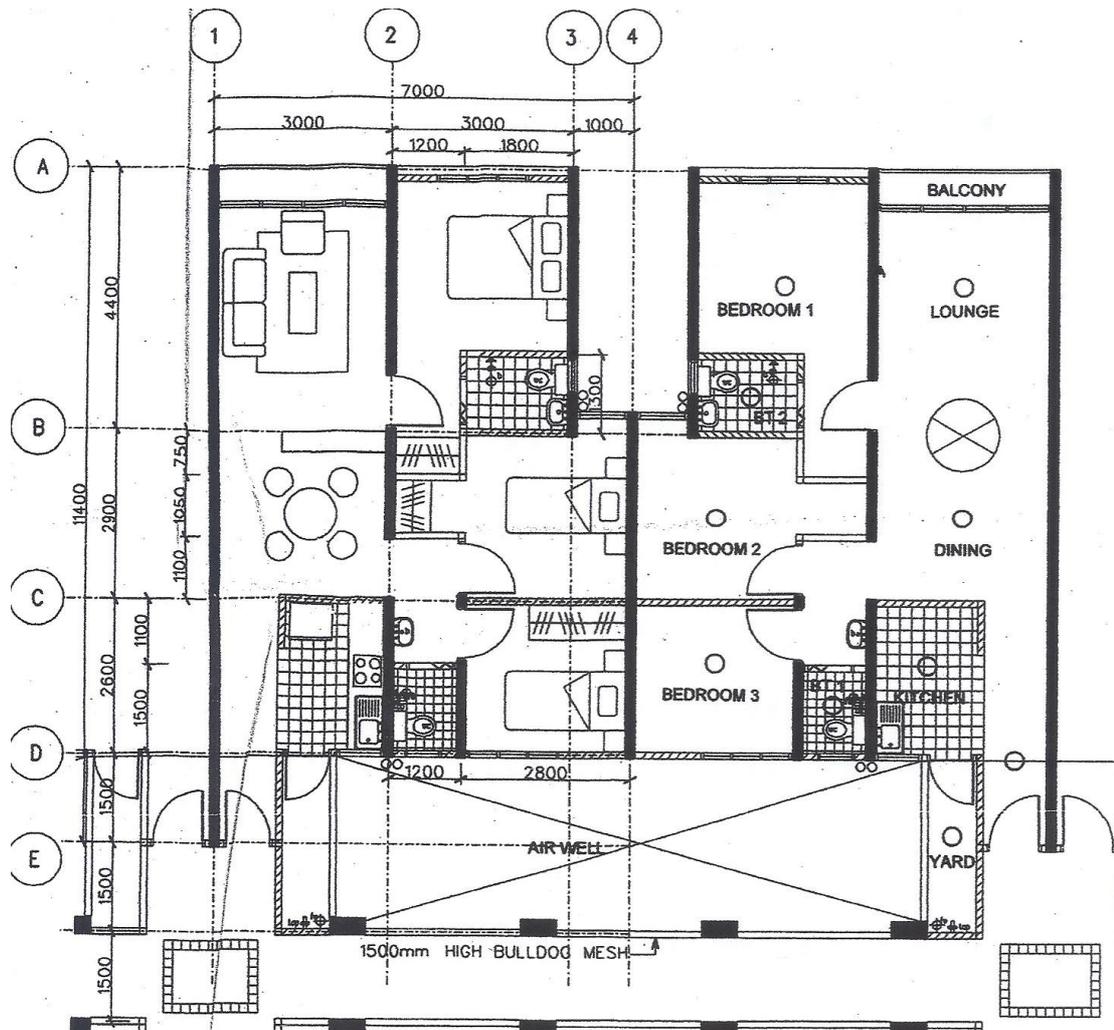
Internal layout plan of two neighbouring units (“BEDROOM 2” and “BEDROOM 3” sharing a common apartment building wall)
